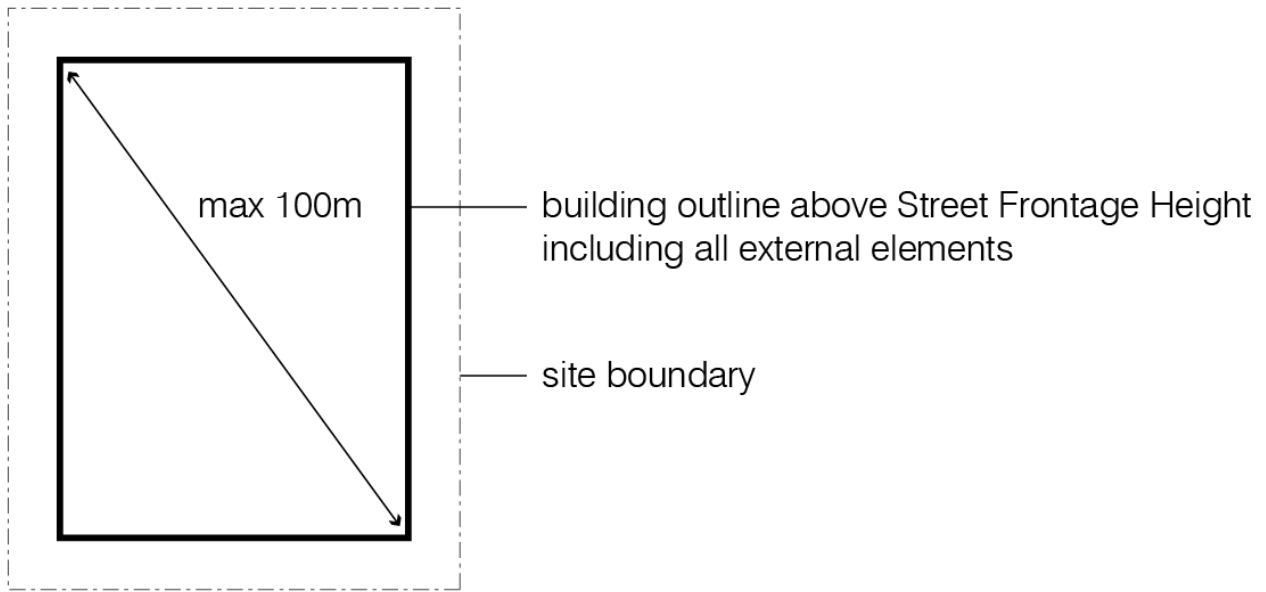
Maximum horizontal dimension of a building above Street Frontage Height
